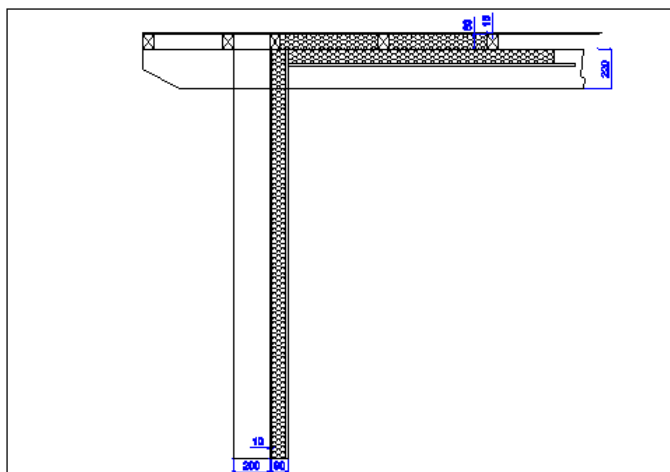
Gable wall to pitched roof connection for existing building. Source: André
